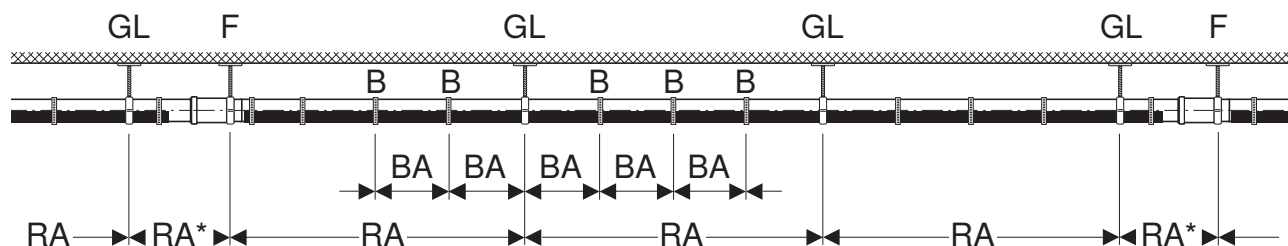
Pipe bracket spacing RA when fastening to ceilings and walls, with support shells
